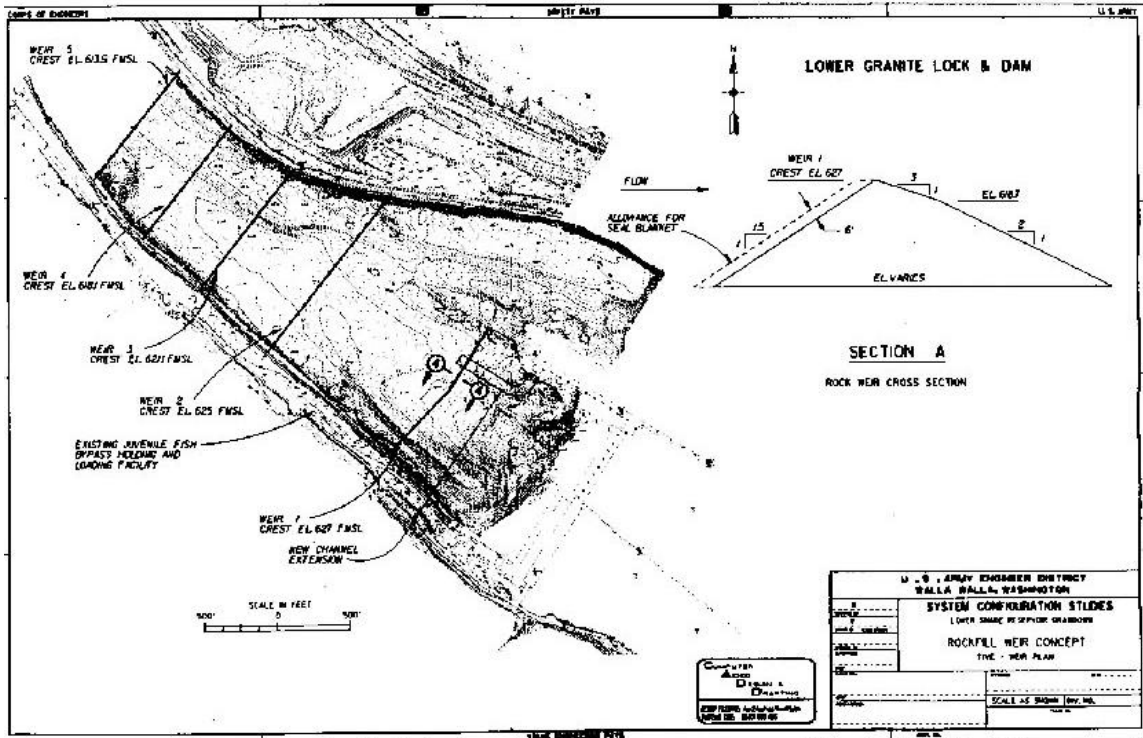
Rockfill Weir Concept--Five-Weir Plan
